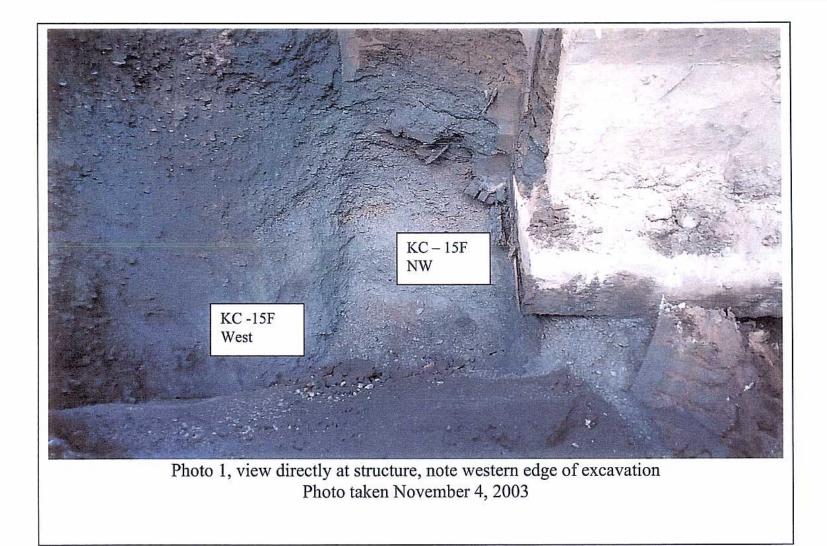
provides an indication of proximity of contaminated material on the west side of the excavation.
